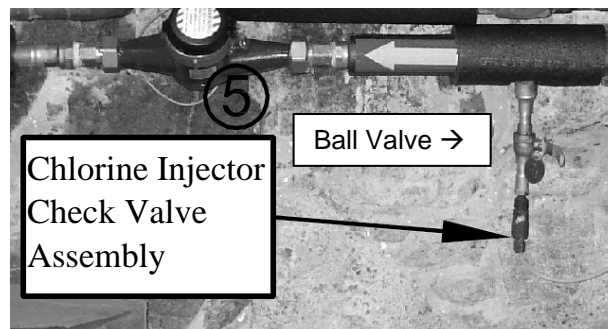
Figure B - This is the proper way to install the Chlorine Injector Check Valve Assembly (note that injector Tee should be Brass or PVC to resist corrosion)
